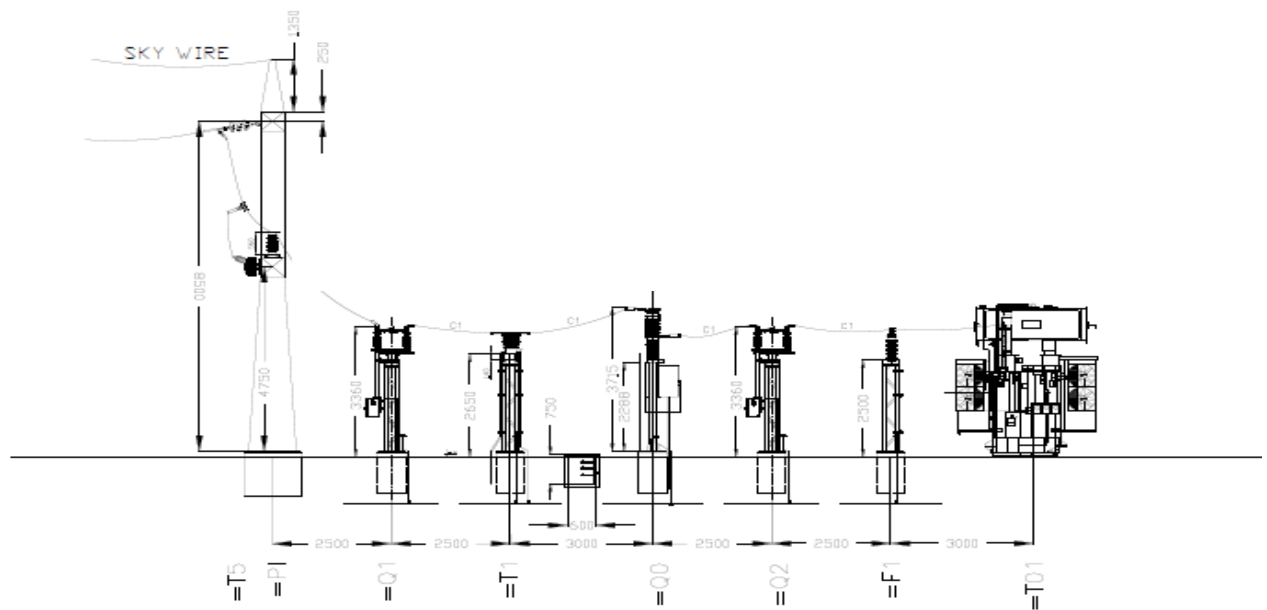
Cross-sectional drawing of Switchyard equipment of New Bussa injection station
